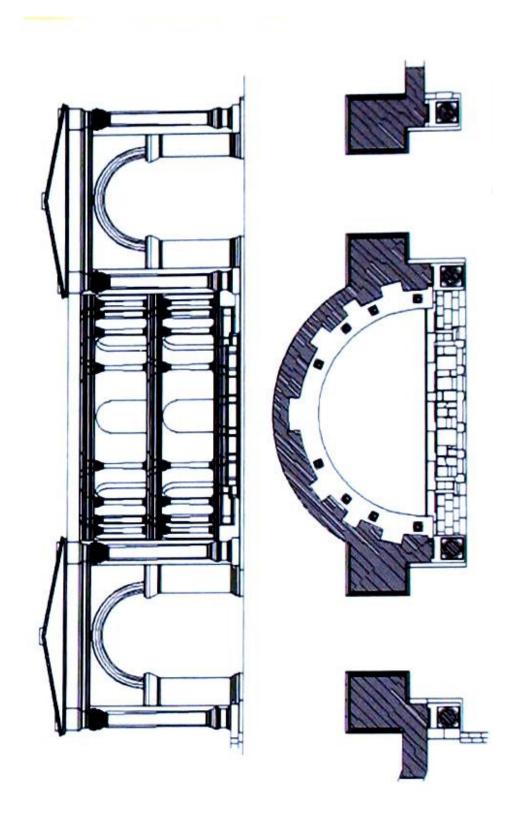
Inside facade and plan of the city gate (Archeological excavation team)
